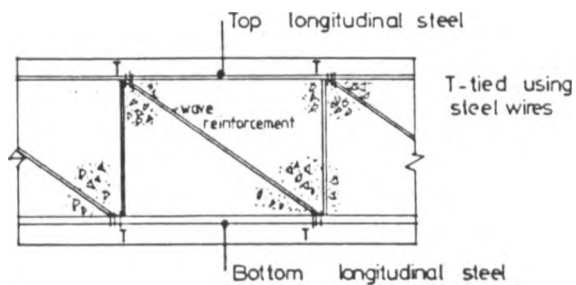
'ANCHORAGE' PROVIDED BY
